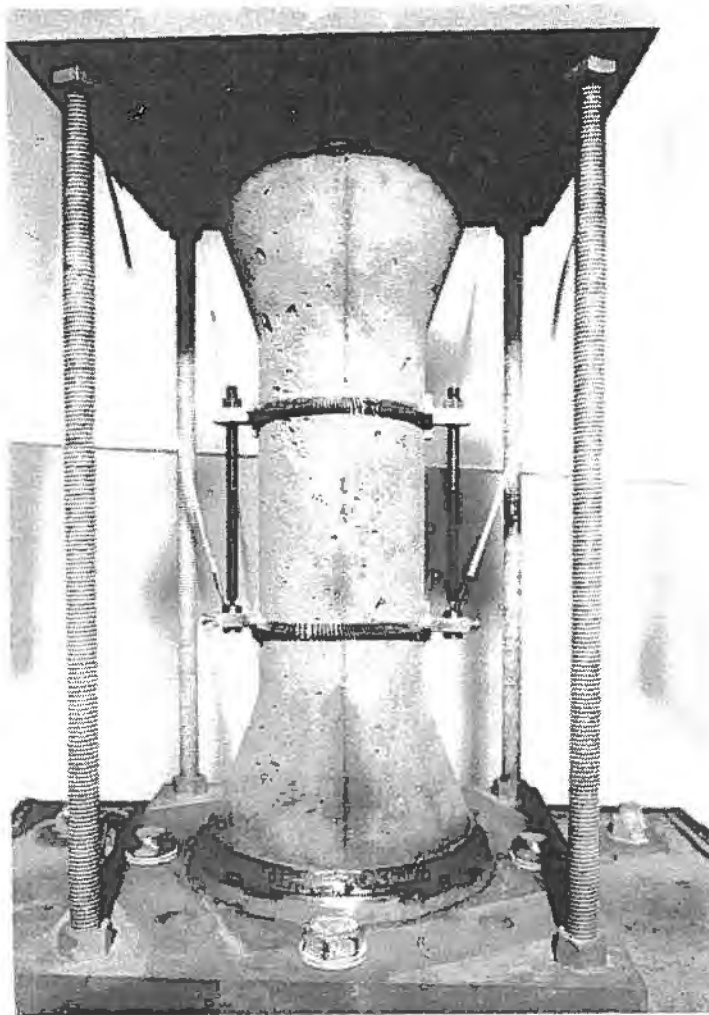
Test set-up: Concrete specimen with deformation gauges.
